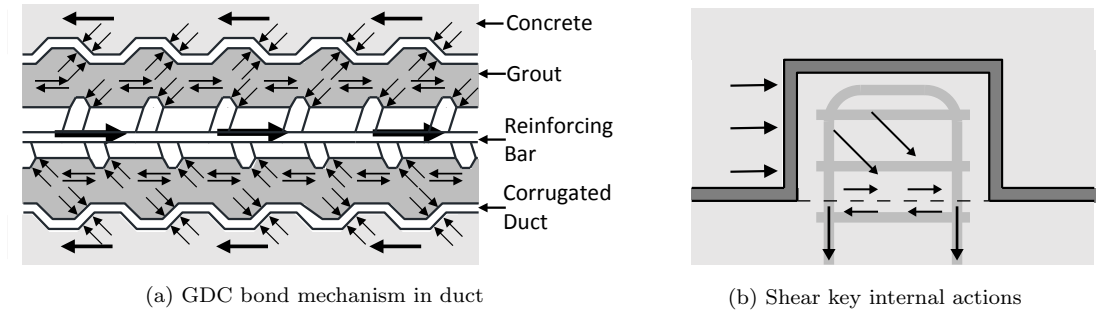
Grouted Duct Connection bond mechanism and shear key detail
